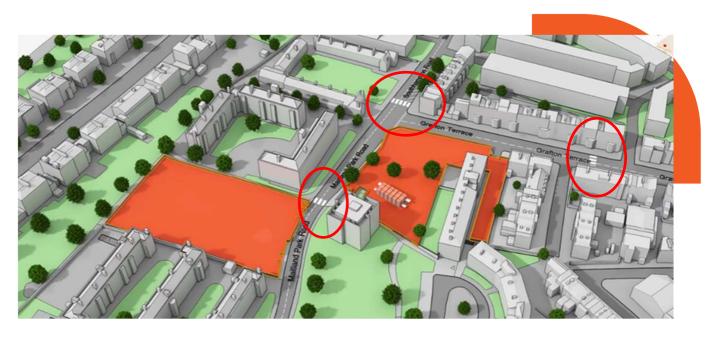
Installation of new pedestrain crossing w/c 22/02/2021
